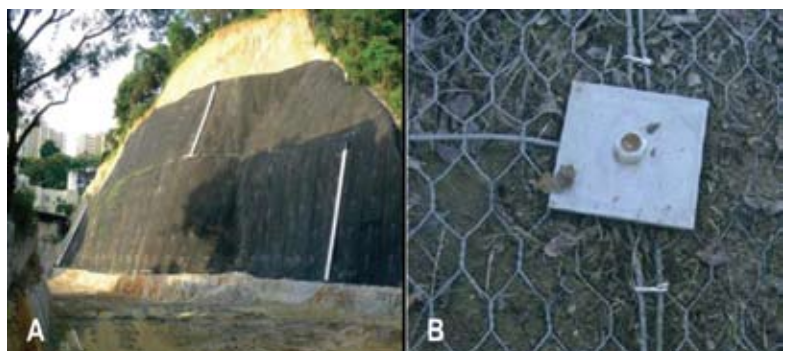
(A) Soil Nailing & (B) Anchor and Steel Grid
